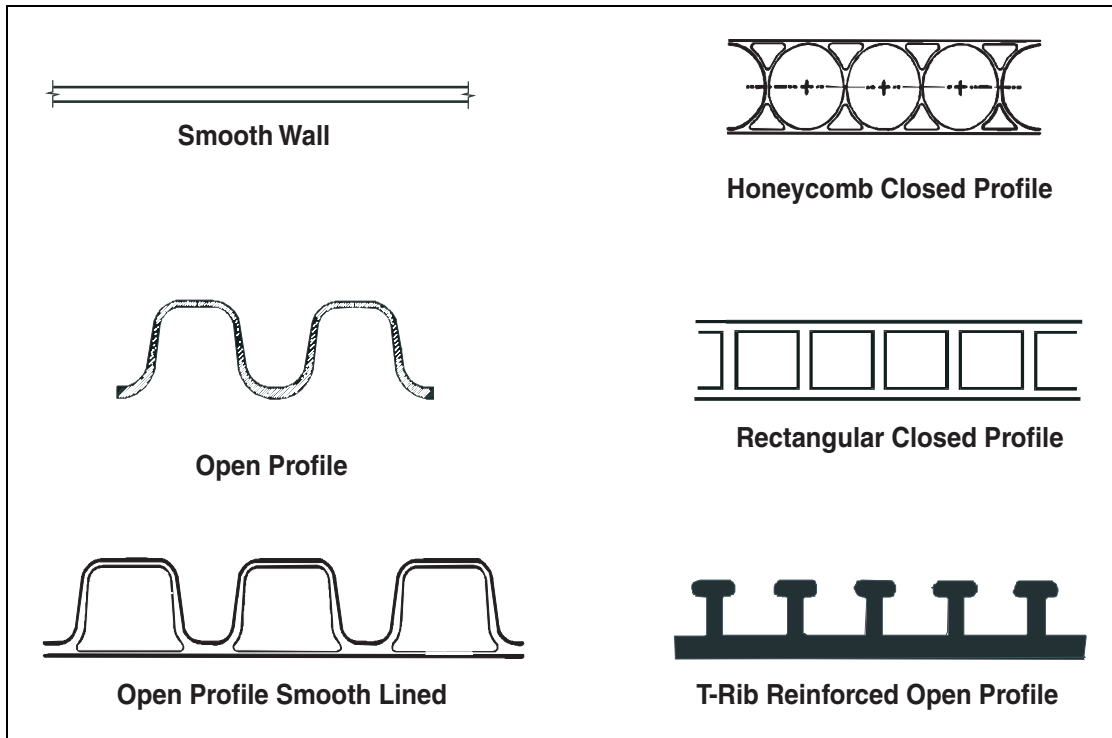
Selected examples of thermoplastic culvert wall profiles.
